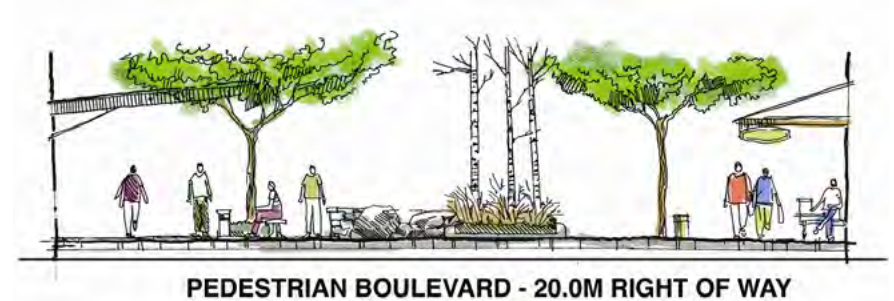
CONCEPTUAL CROSS SECTION OF THE PEDESTRIAN BOULEVARD, SKETCH BY MIKO BETANZO
